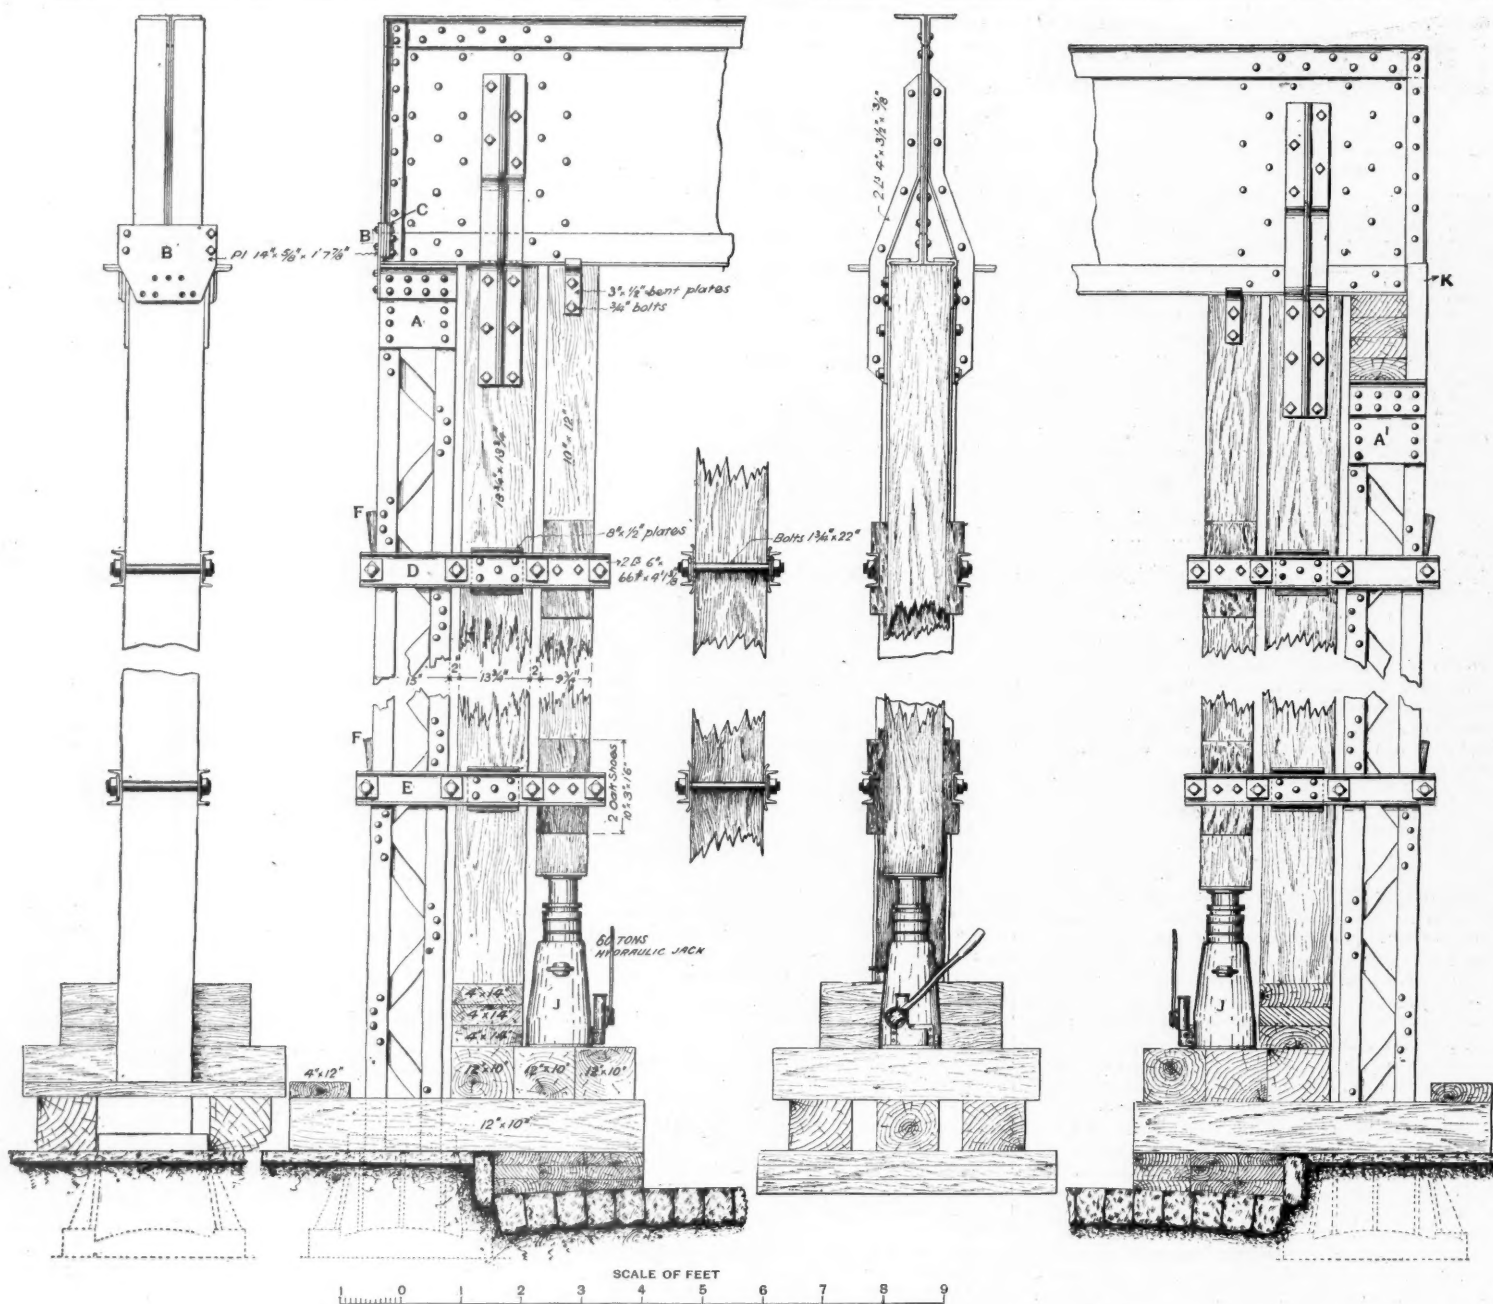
METHOD OF LOWERING THE GRADE OF THE BROOKLYN ELEVATED RAILROAD.
